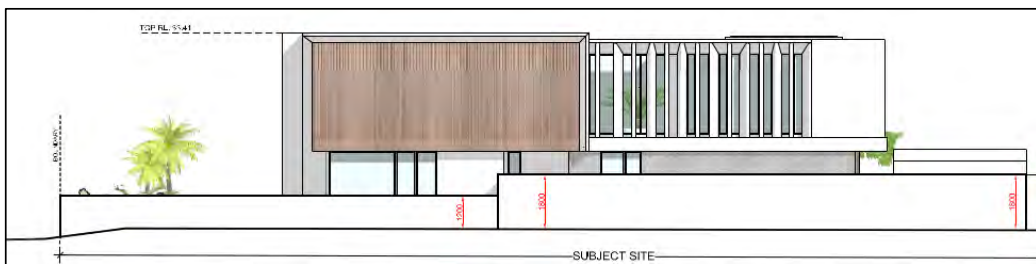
Refused Parsons Avenue Streetscape/Fence Elevation.
